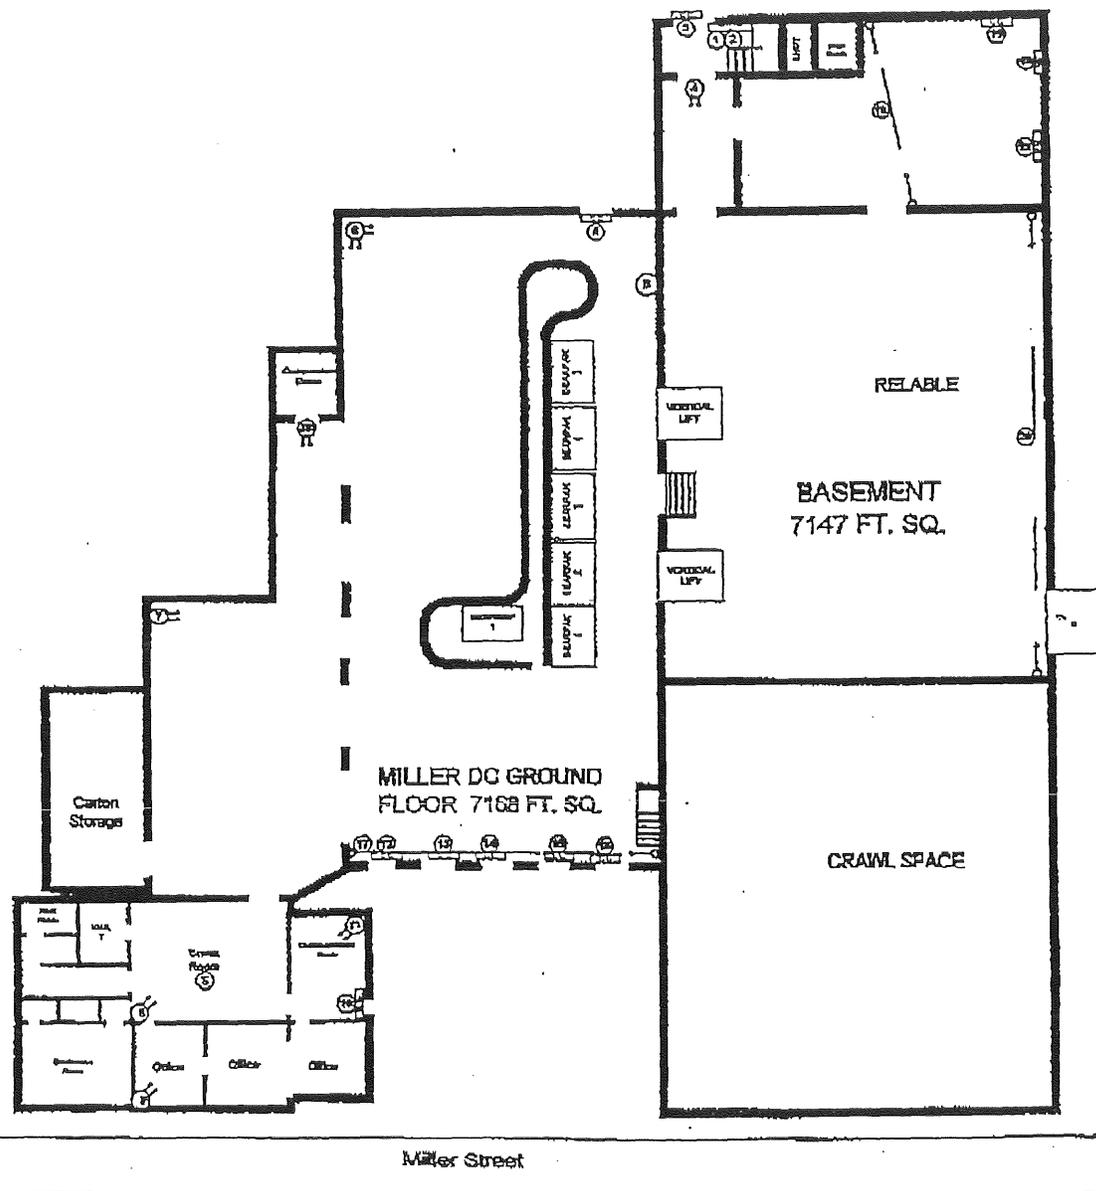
Exhibit B: Piedmont Buggy Factory. Basement and addition floor plan, 1998. Not to scale. North is left.
